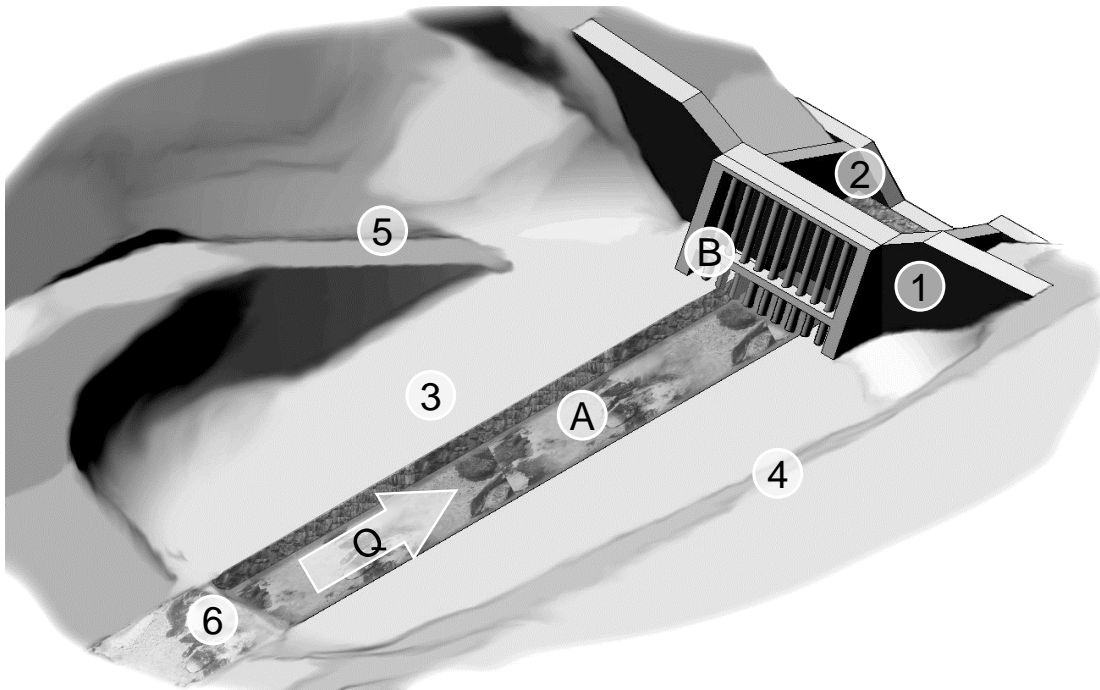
Concept of a permeable sediment trap consisting of ① an open barrier (open check dam) with overflow crest for flood release, followed by ② downstream abutments with counter dam (sill); ③ a reservoir or deposition area, limited by ④ lateral dykes; ⑤ a maintenance access; and ⑥ an inlet structure with scour protection (adapted from Zollinger, 1983; Piton and Recking, 2016a). For permeable sediment traps, the novel element of ① a guiding channel is introduced with ② a barrier consisting of a bar screen for mechanical control and a barrier with an opening for the hydraulic control of bed load retention (cf. Chpt. 6).
